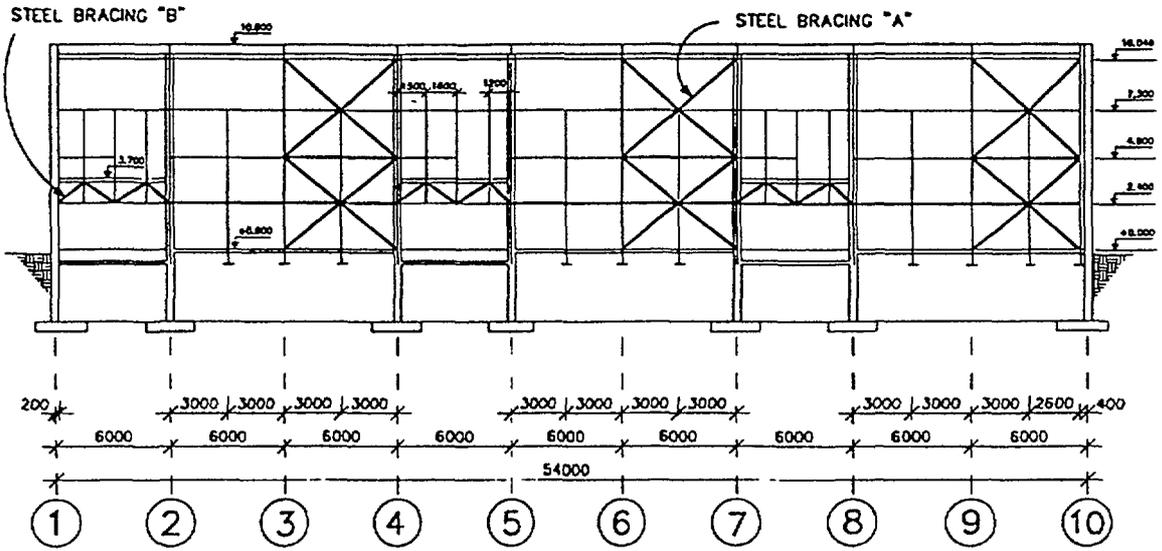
Exterior Wall Elevation At Line "A", Looking South
